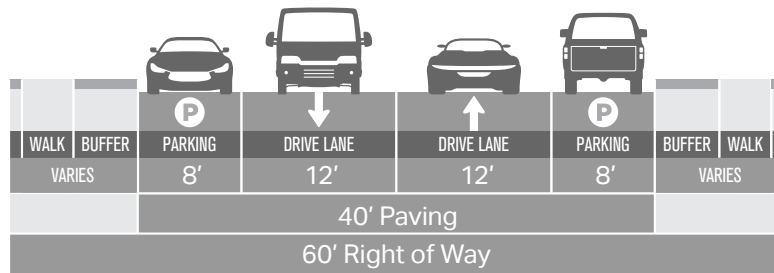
Existing Typical Silver Street Section: South of Washington Avenue
